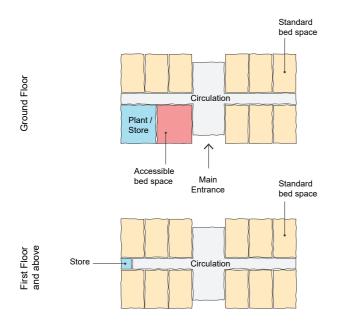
Small Accommodation Block Layout (3 and 4 Storey)
